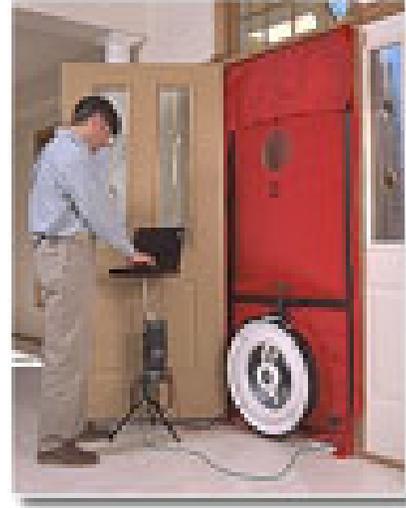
Performing a Blower Door Test for Testing Air Infiltration Rates
